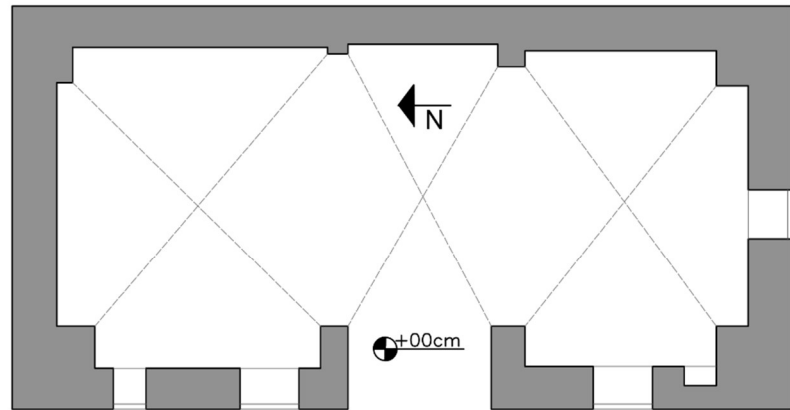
(b): Plan of Haret Jandal Vaulted Liwan House, Source: Author
